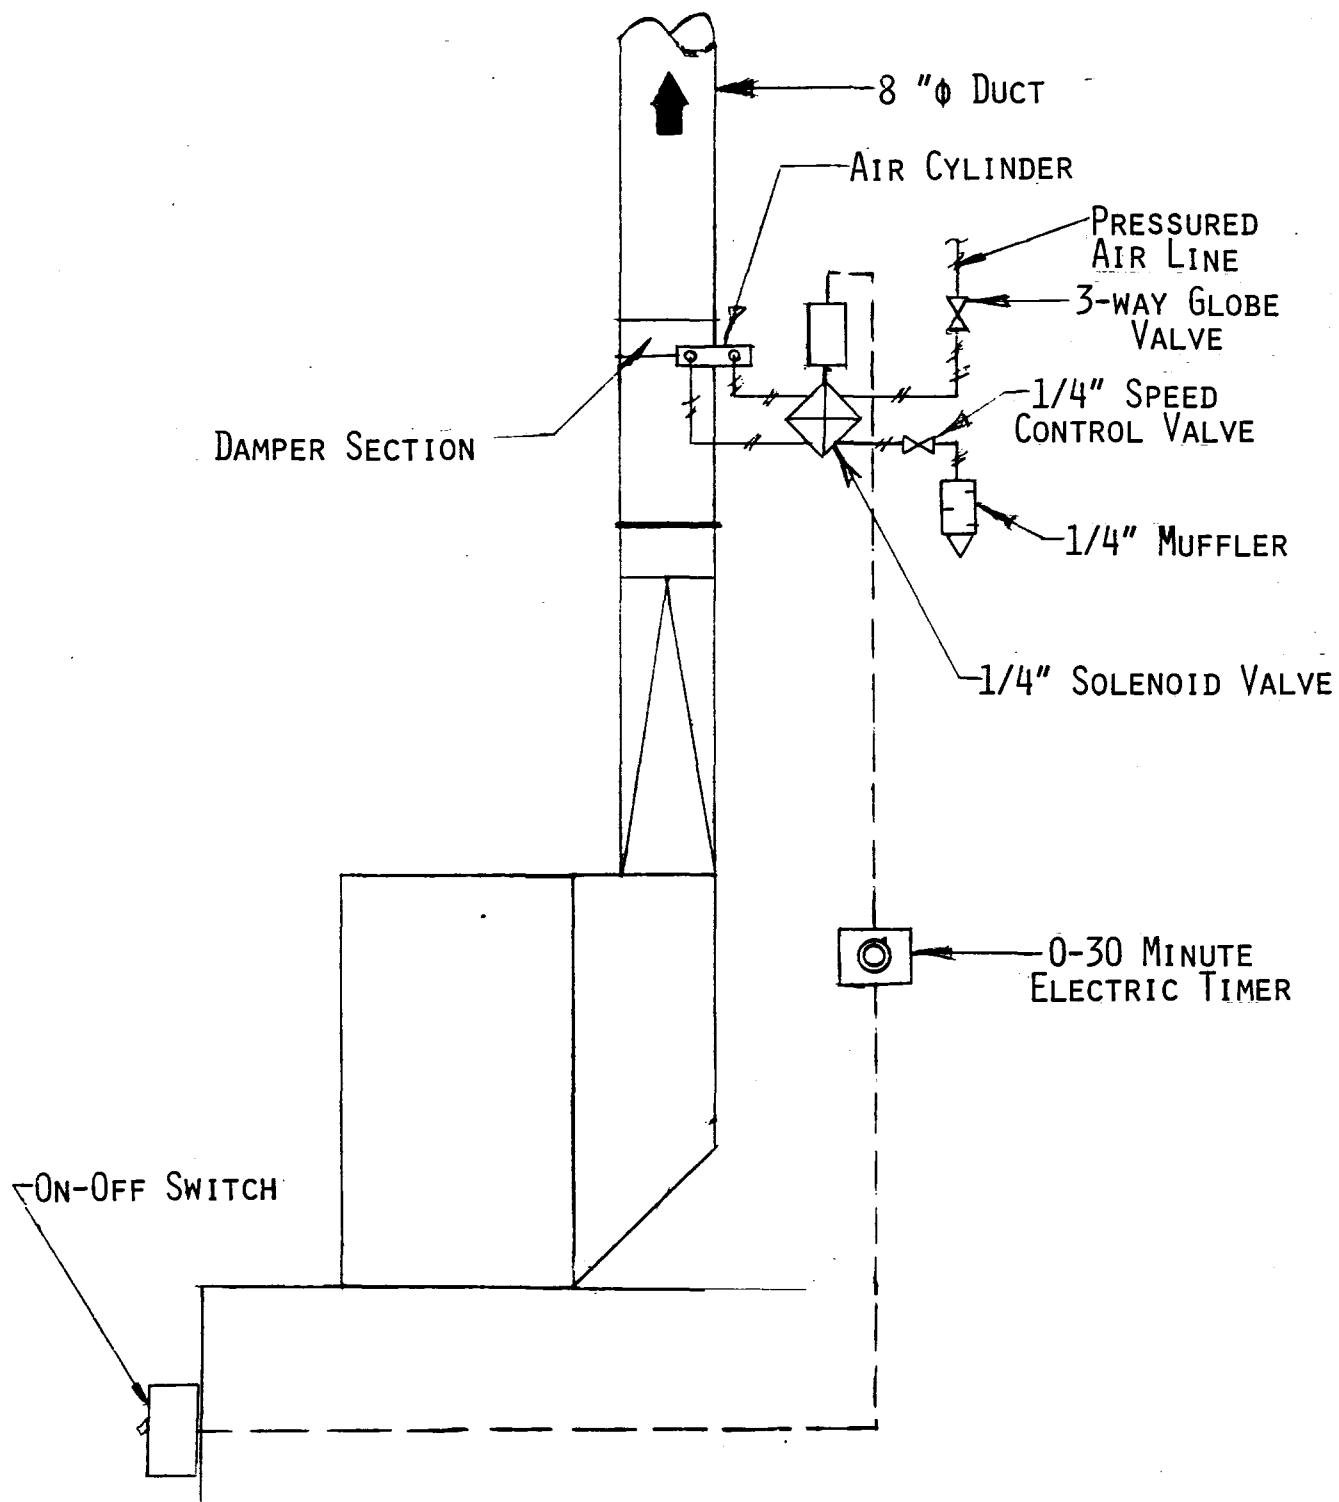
Kaolin slurry mixing tank hood duct damper actuator schematic.
